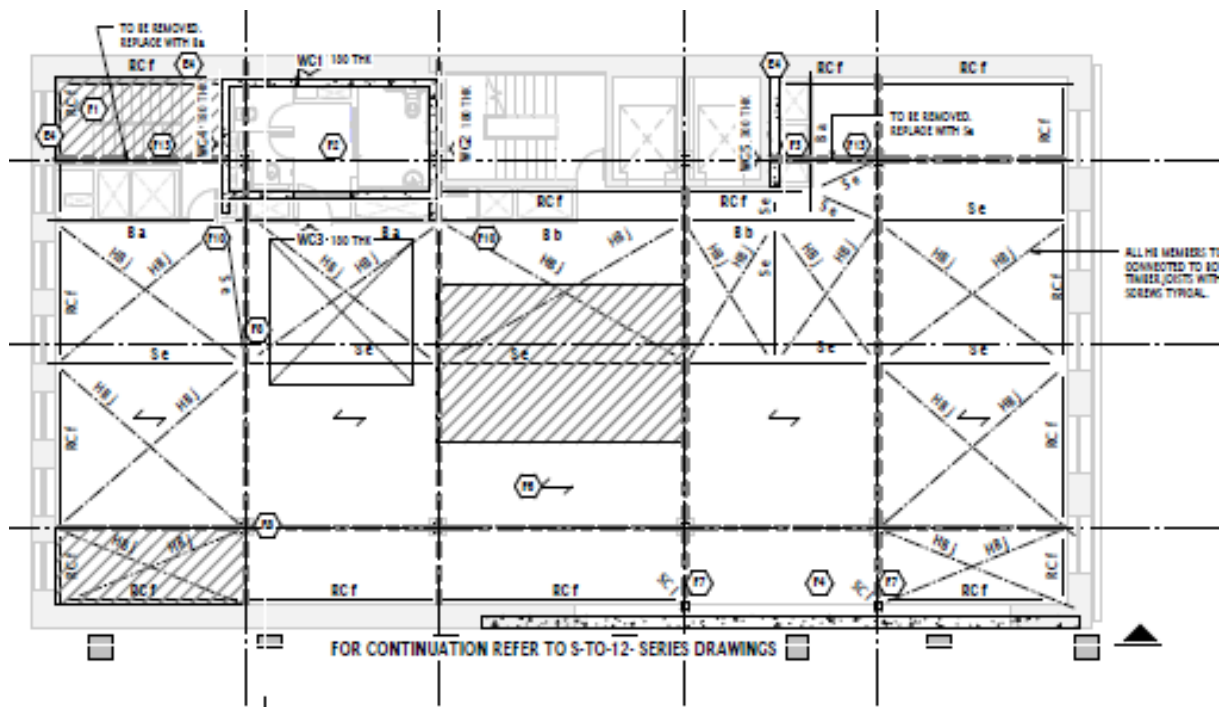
Existing roof level plan—general arrangement. Hatched areas show previous infill structure, and the tower crane location is also shown in the second bay from the left. (Source: RBG, drawing number 285-12-06-00, 2016)
